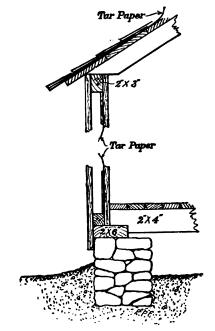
HOLLOW WALLS AND FOUNDATION.
